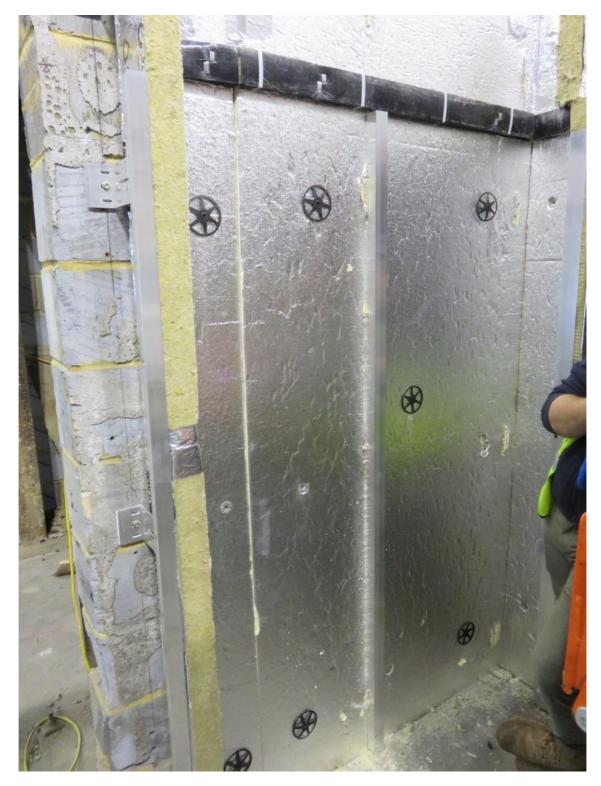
Insulation fixings applied and 'L'-rail embedded into panel.
